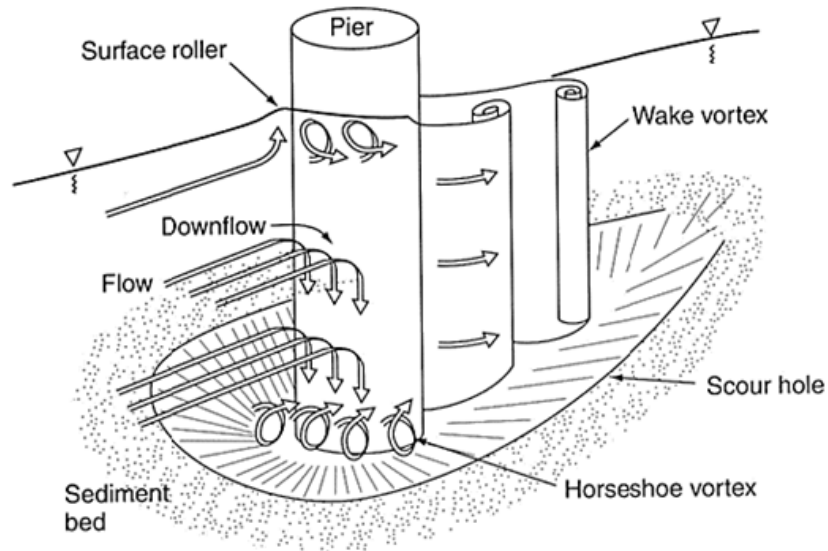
Flow behaviour around a bridge pier from Abdalla (2016).
